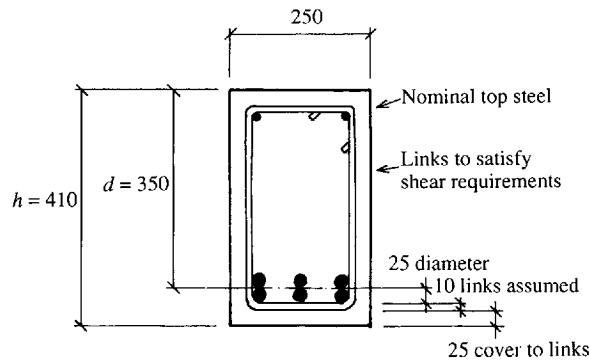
Beam cross-section: grade 30 concrete, MS reinforcement
